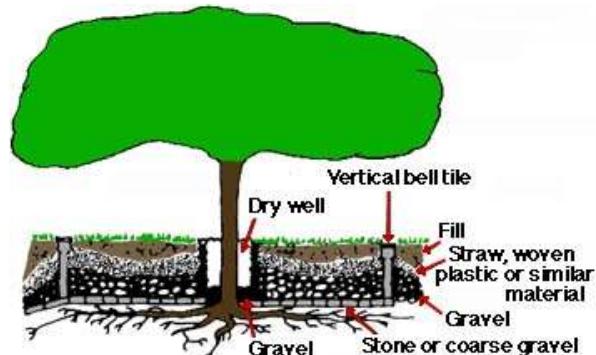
A cross section of a completed fill is shown around an established tree. Soil fill is placed over the ventilating tile system.
